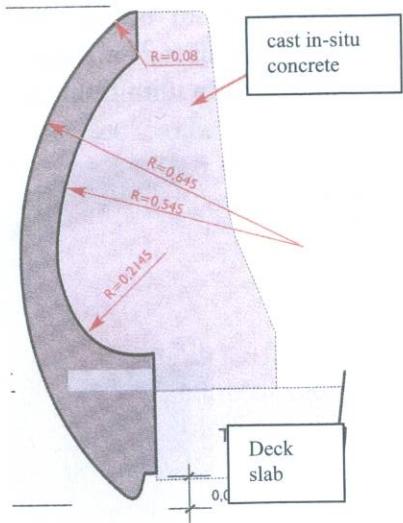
Precast edge profiles with backing cast in-situ concrete
